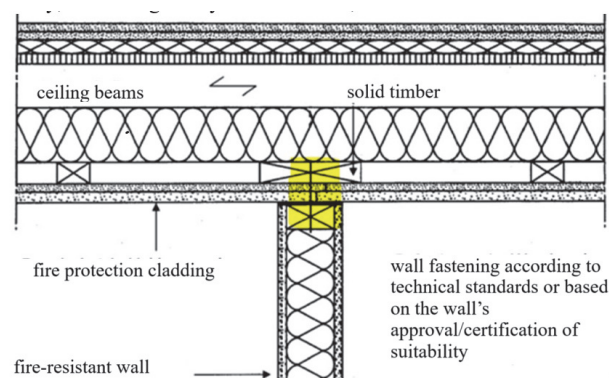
Connection of load-bearing and room-enclosing wall to ceiling, with the ceiling joists oriented perpendicular to the wall (vertical section)
